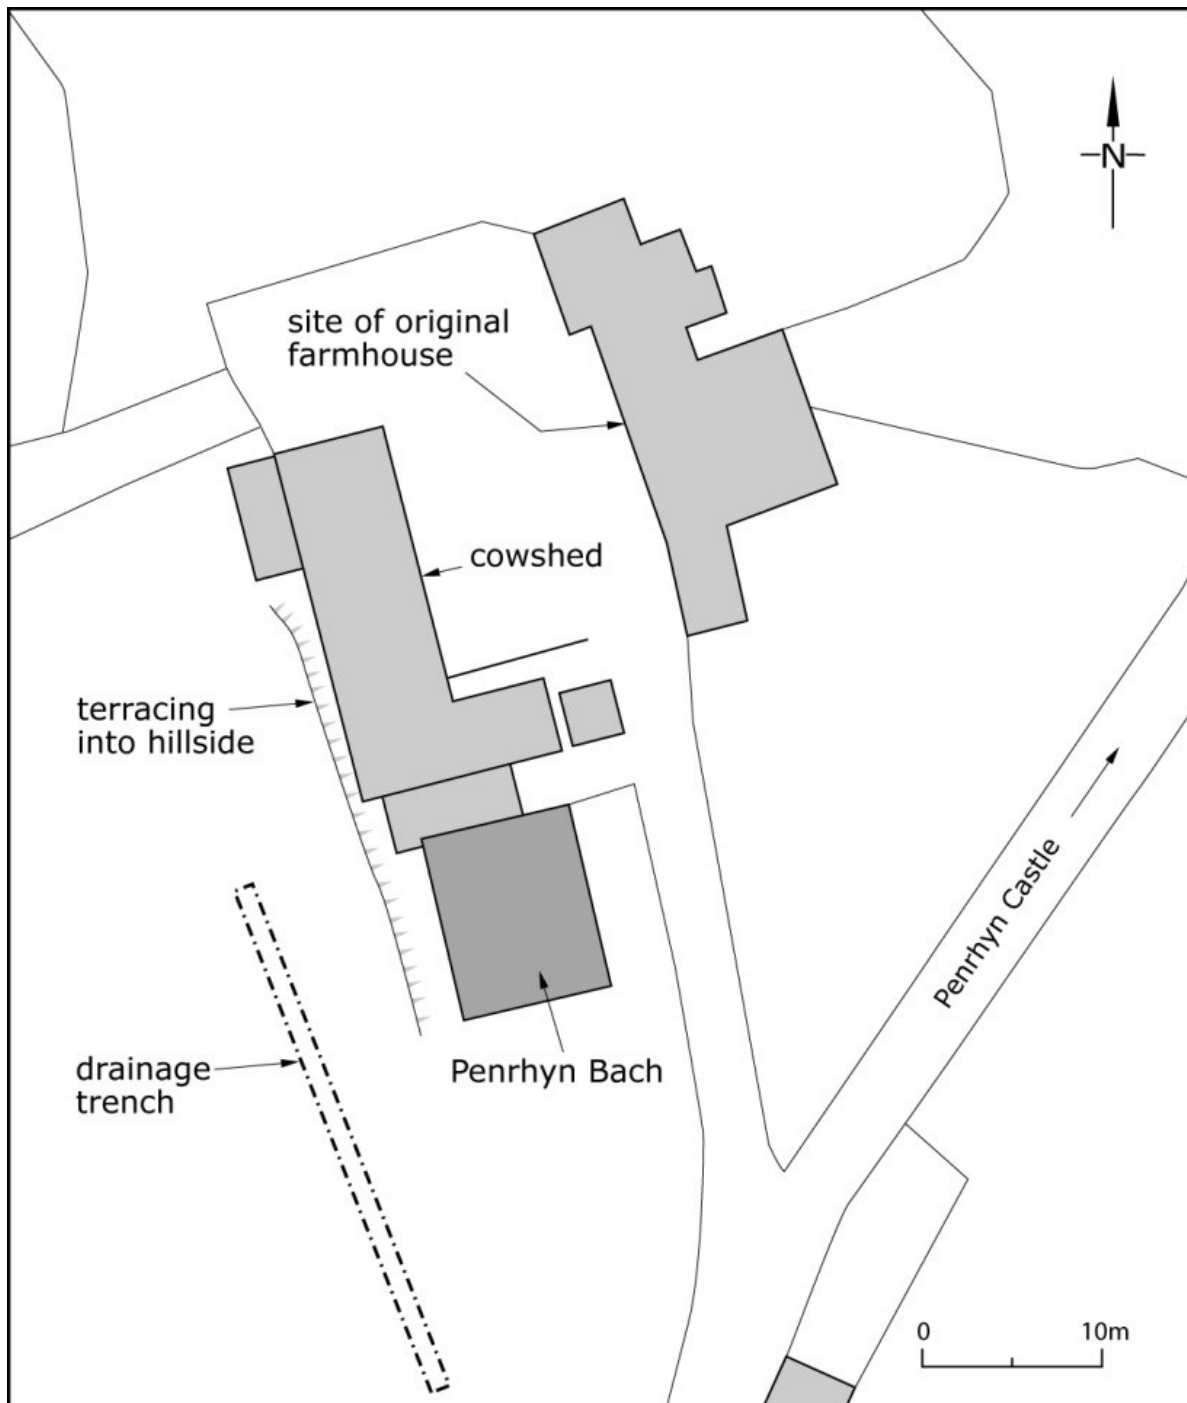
Plan of Penrhyn Bach farm showing location of drainage trench monitored in the watching brief.
